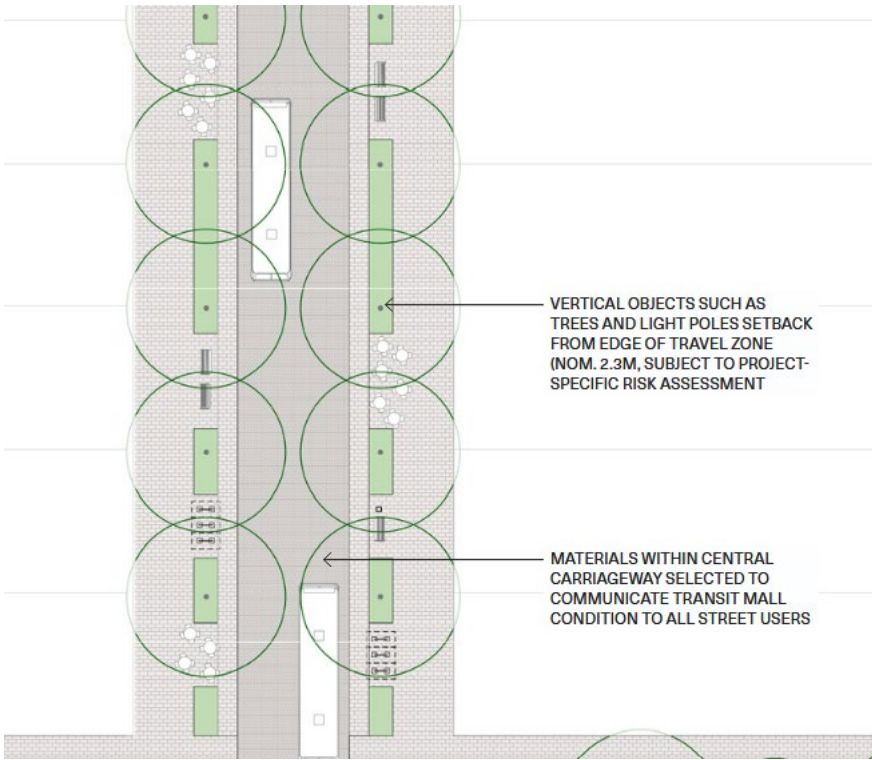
Typical concept plan – Transit Mall, Western Sydney Street Design Guide
